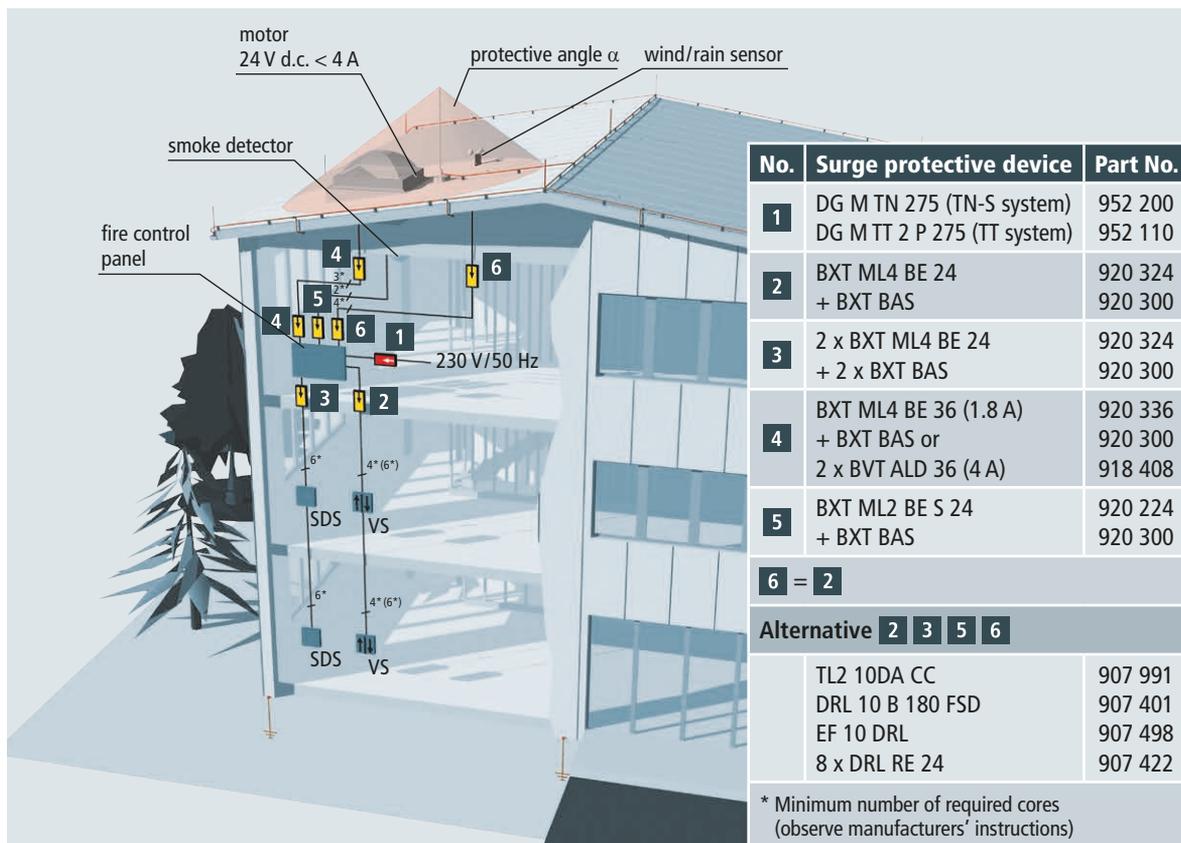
Domelight located in the protected volume of an air-termination rod on a metal roof of a structure with metal down conductor (steel frame, interconnected reinforced concrete or earthed metal facade)
